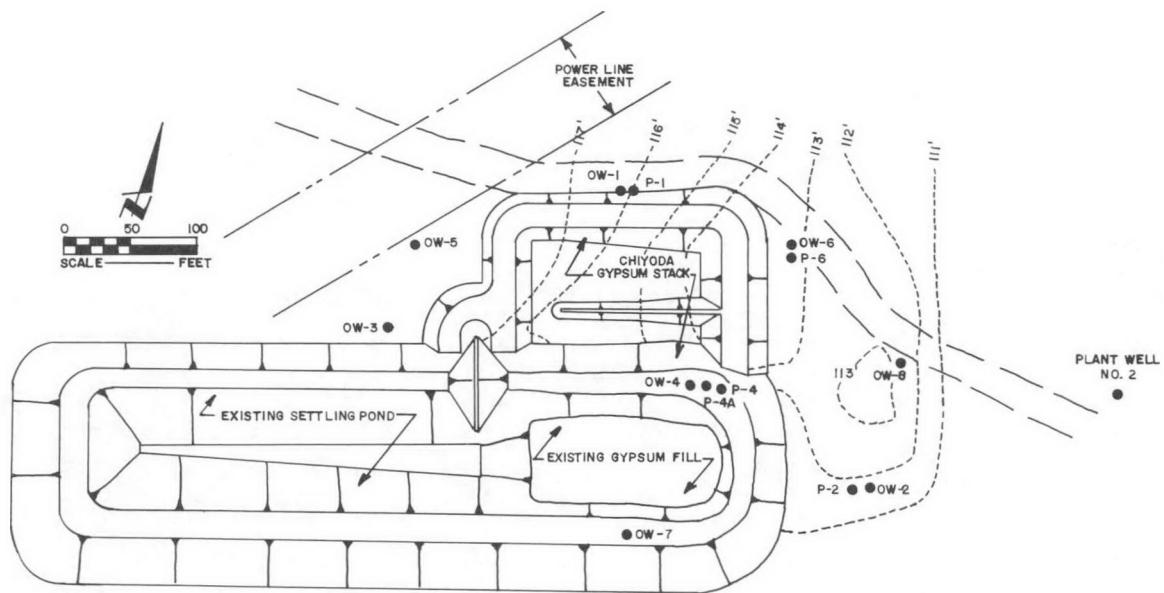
Groundwater Monitoring Location Plan And Profile
